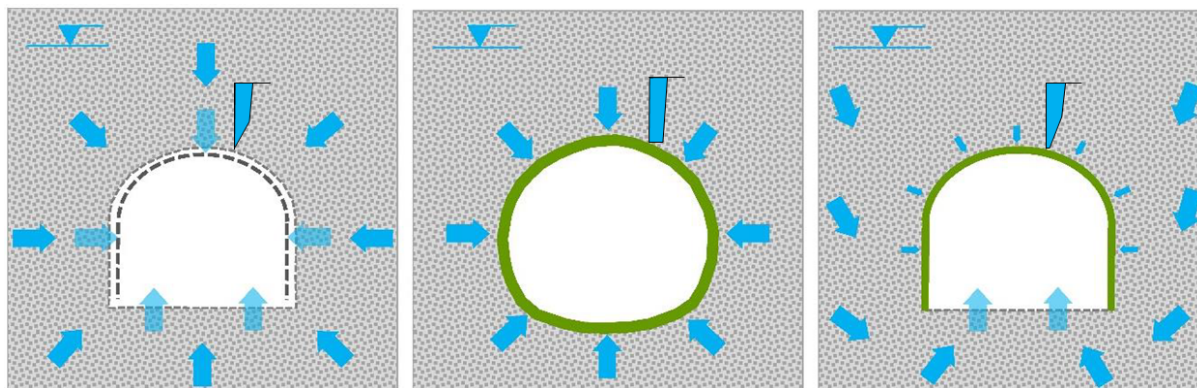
Figure shows a conceptual view of how different water protection influences water flow and groundwater pressure. From the left; a drained tunnel, an undrained tunnel, and a partially drained tunnel. After Holter (2015).
